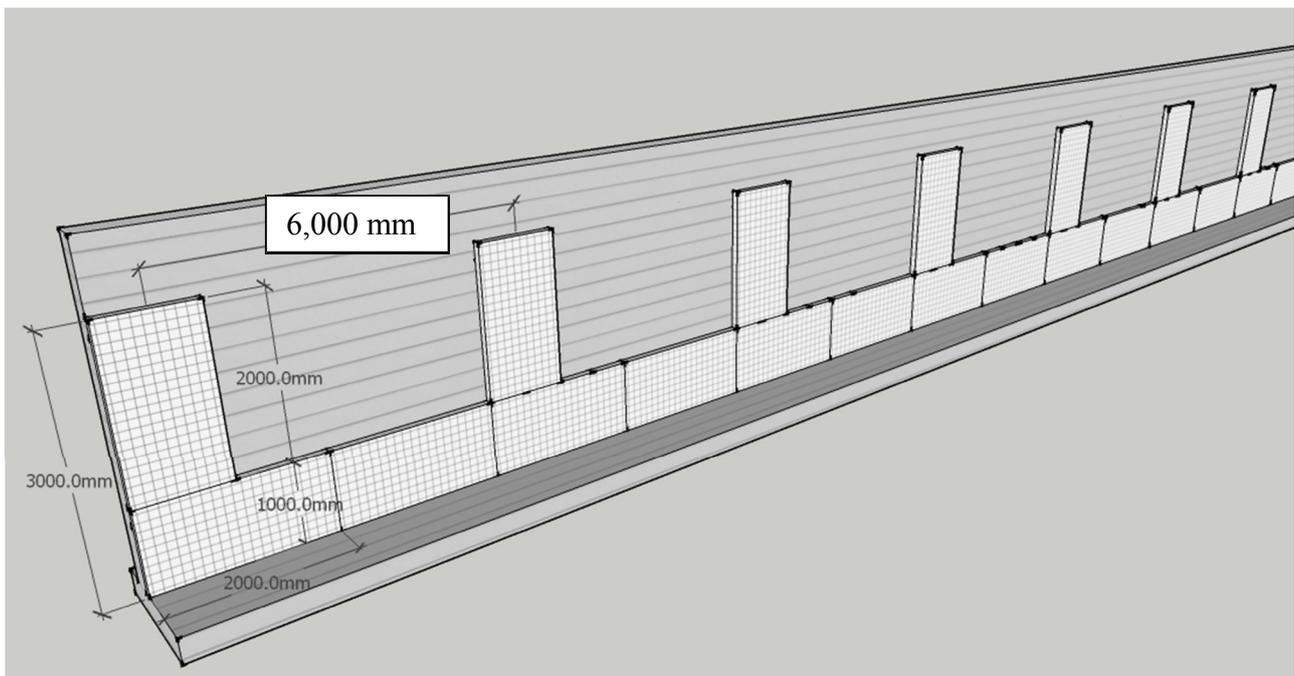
Drainage pillar layout H=2, centre distance 6 m
